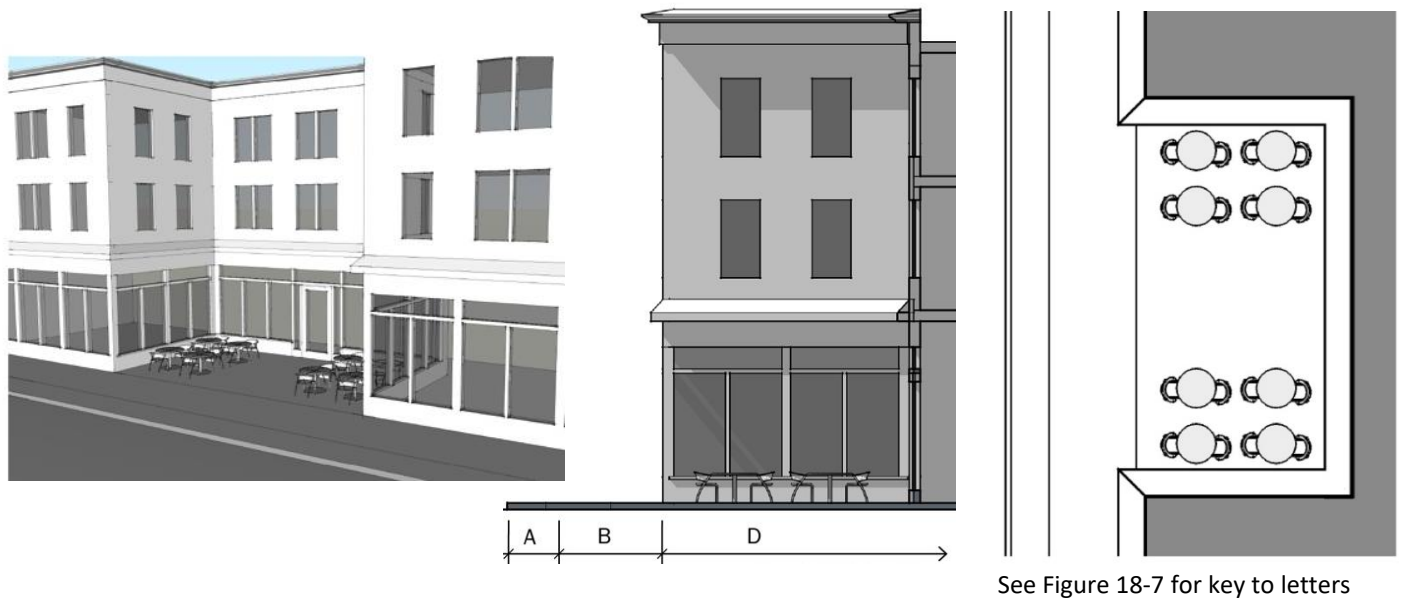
Illustrative View, Section View, and Plan View of Forecourt Frontage Type
